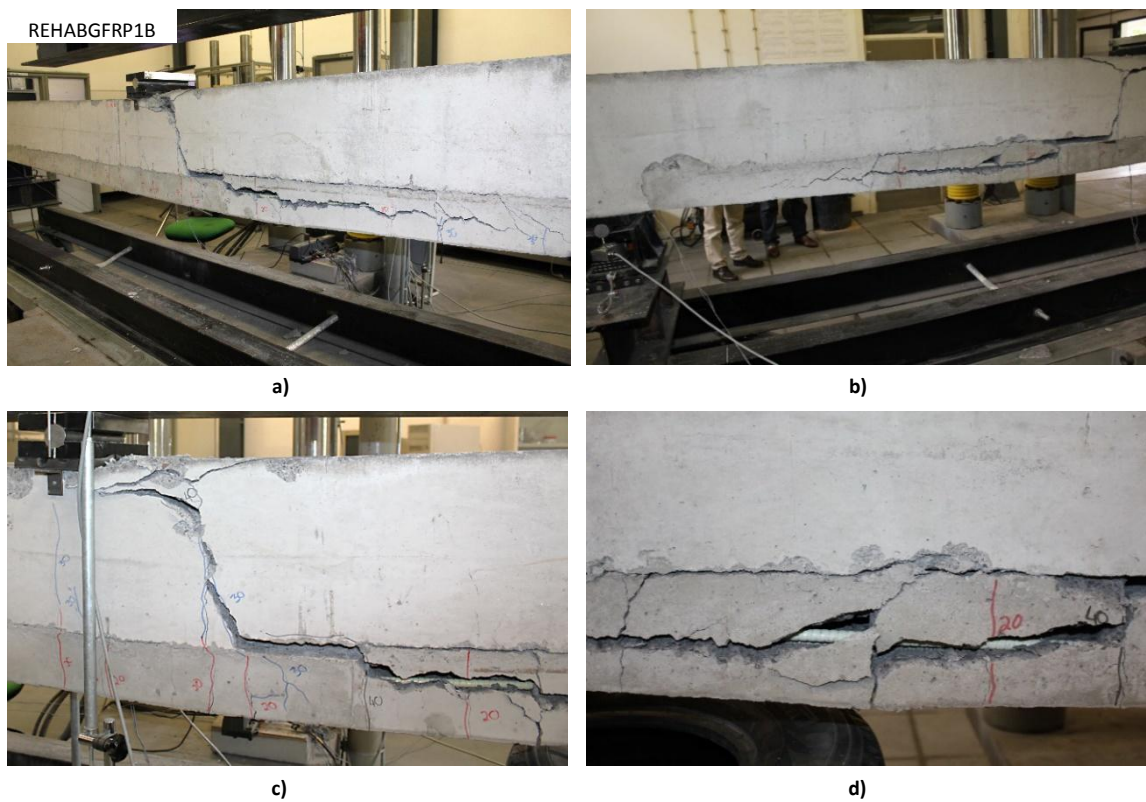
REHABGFRP1B: a) front general view; b) back general view mid-span detail d) concrete layers detail
